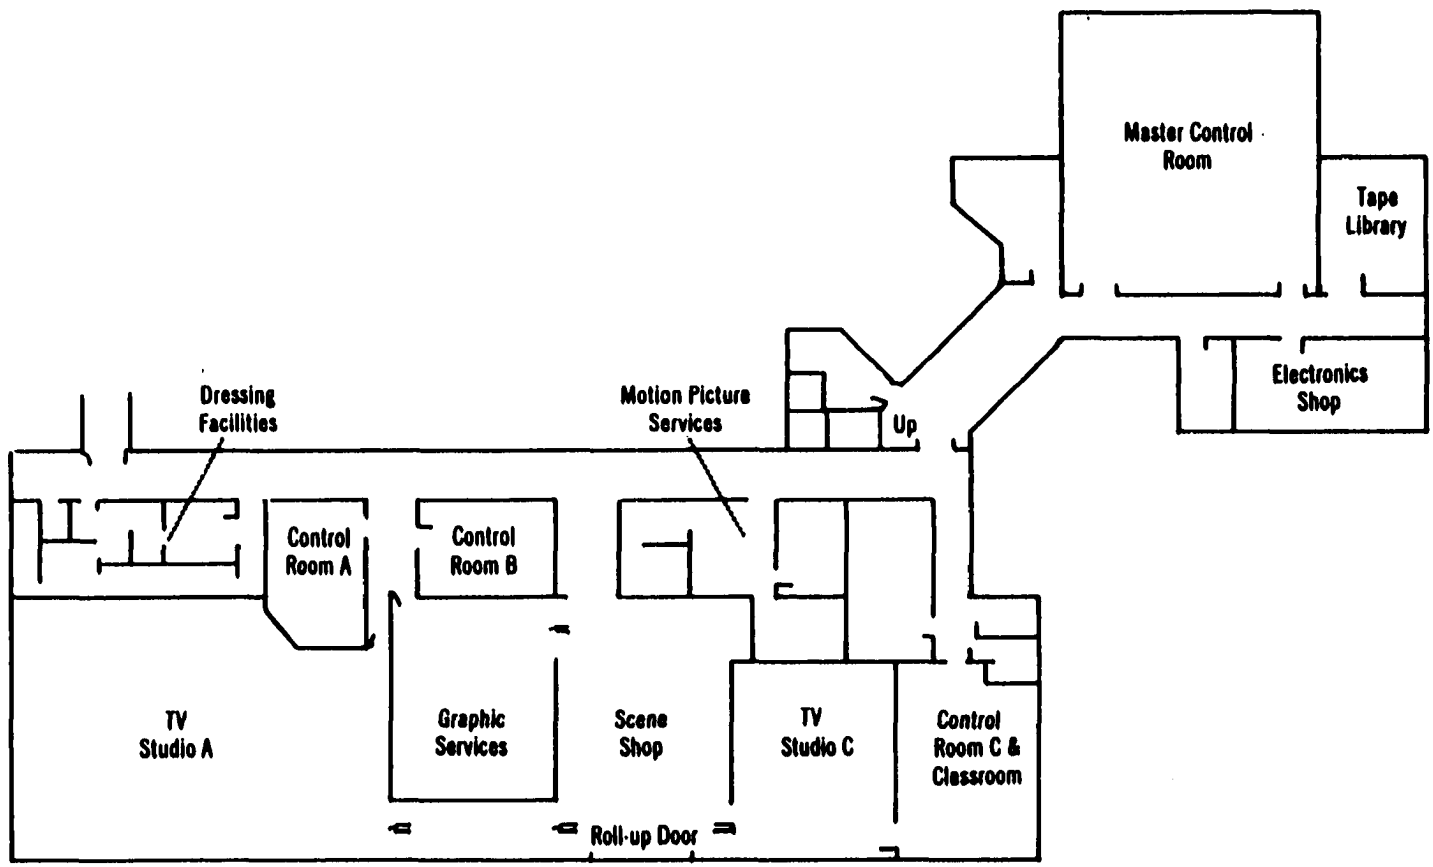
Floor Plan of Western Michigan University's Television Complex.
